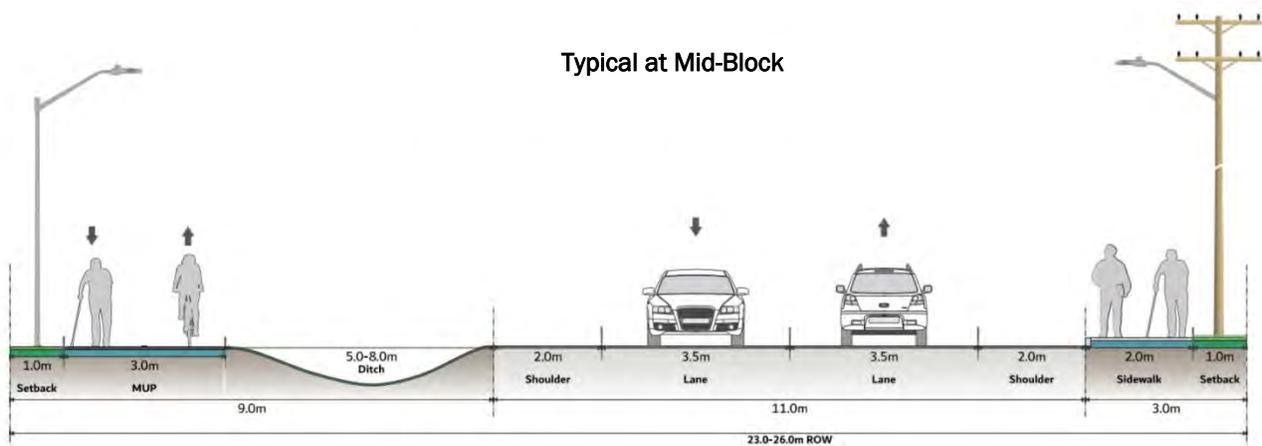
Alternative 1 – Two Lane Roadway with Designated Cycling Lanes - Typical Cross Section at Mid-Block Location
